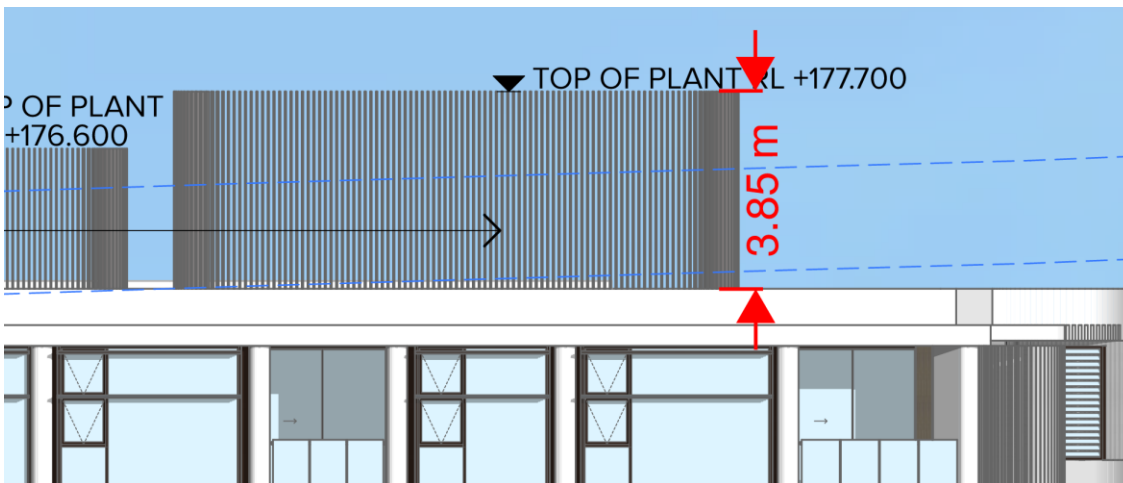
Height of Roof Plant Equipment (Source: Turner & Marked-up by Gyde)
